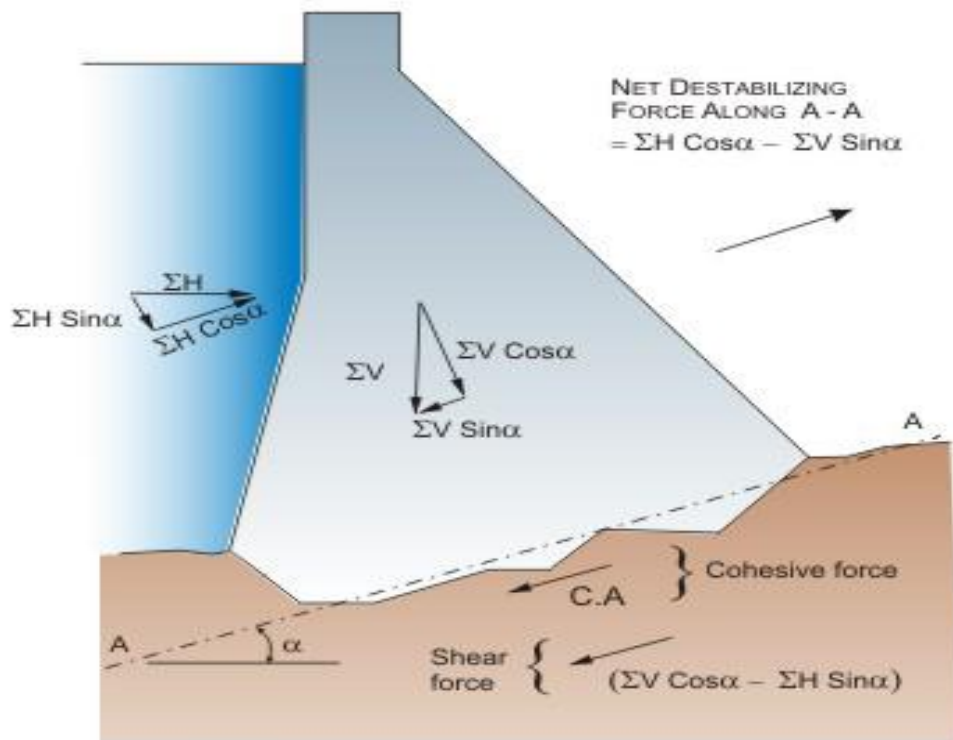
Stability against sliding along concrete dam - rock base interface. Good rock is assumed to exist below
